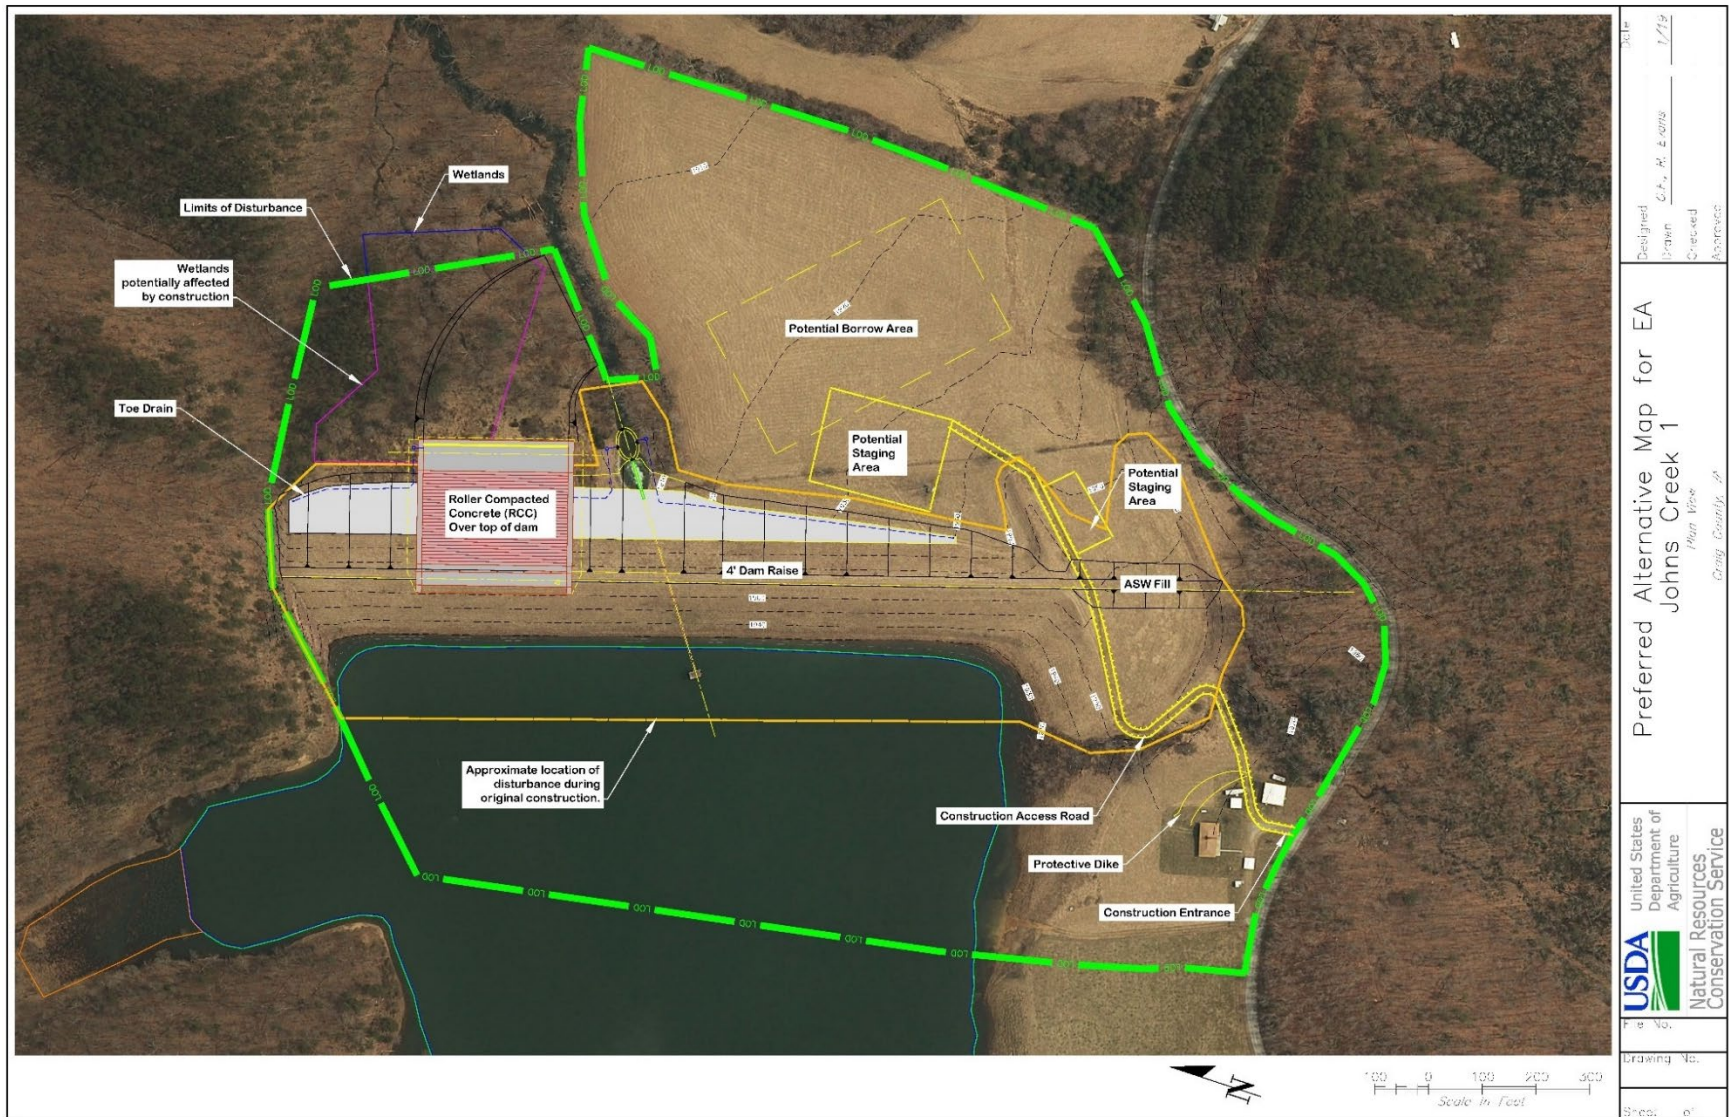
Plan View of Preferred Alternative – 270-Foot-Wide RCC Chute on the Embankment with 4-Foot Embankment Raise.
